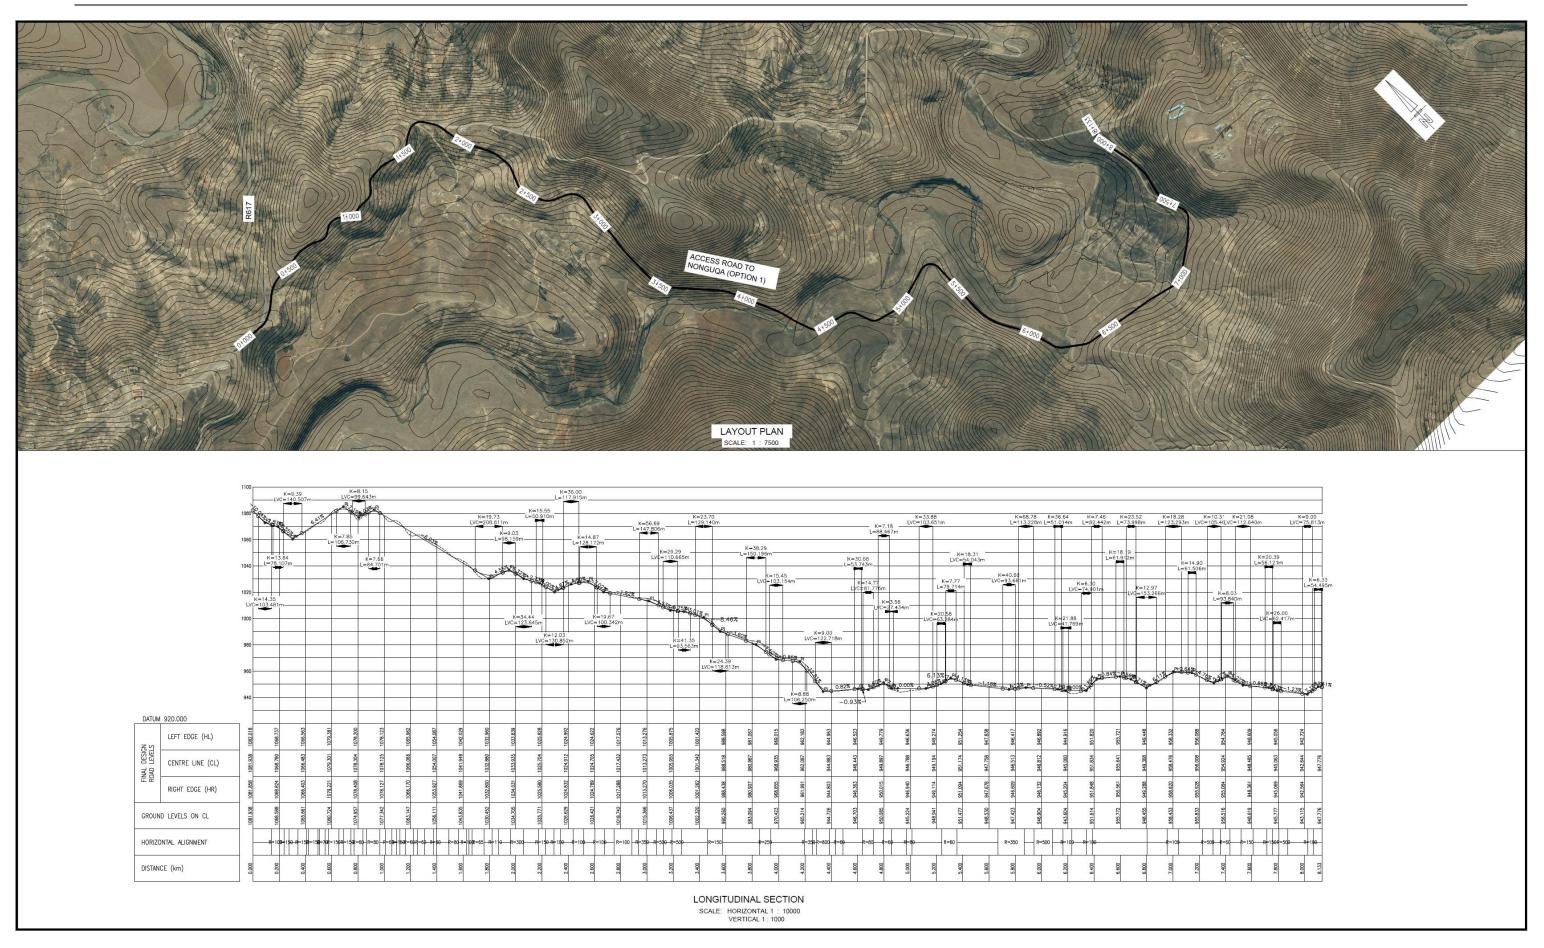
Smithfield Dam – Layout plan and longitudinal section of access road to Nonguqa
